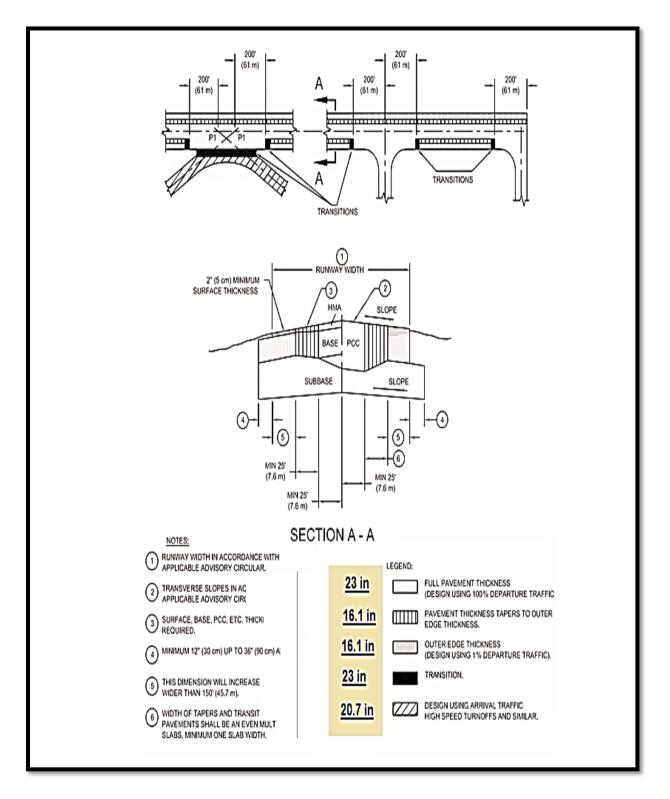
Typical Plan and Cross Section for MEROWI AIRPORT Runway Pavement designed by FAARFIELD program
